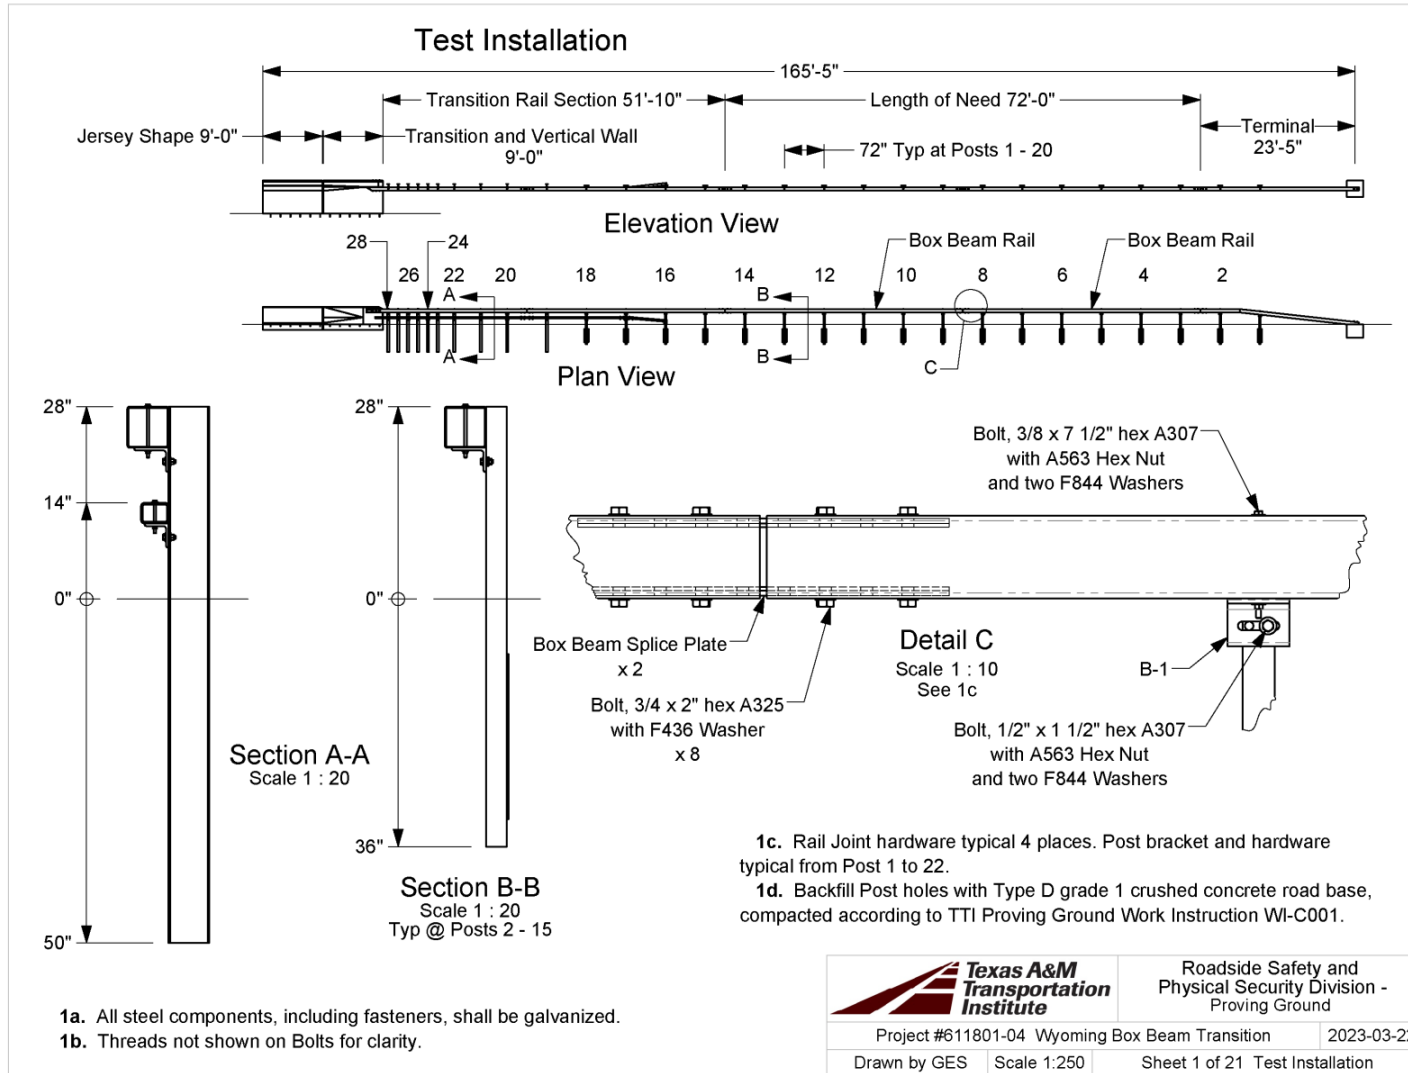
Details of Box Beam Guardrail Transition to Concrete Parapet.
